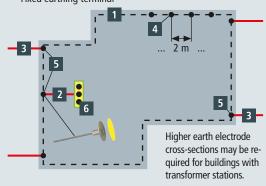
Foundation earth electrode with connection component for the lightning protection system and main equipotential bonding bar
